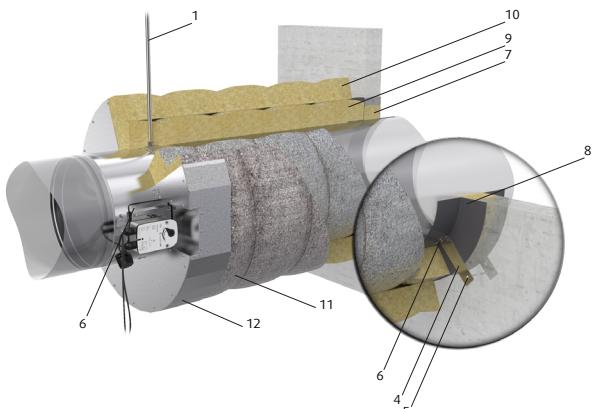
Installation of a round fire damper PKIR on a wall and out of a wall
